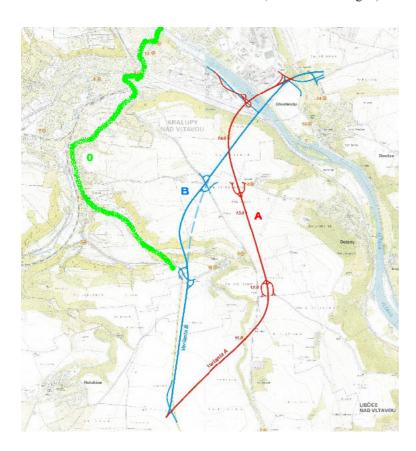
EIA of road construction (0 – contemporary situation, A, B – proposed variants)
